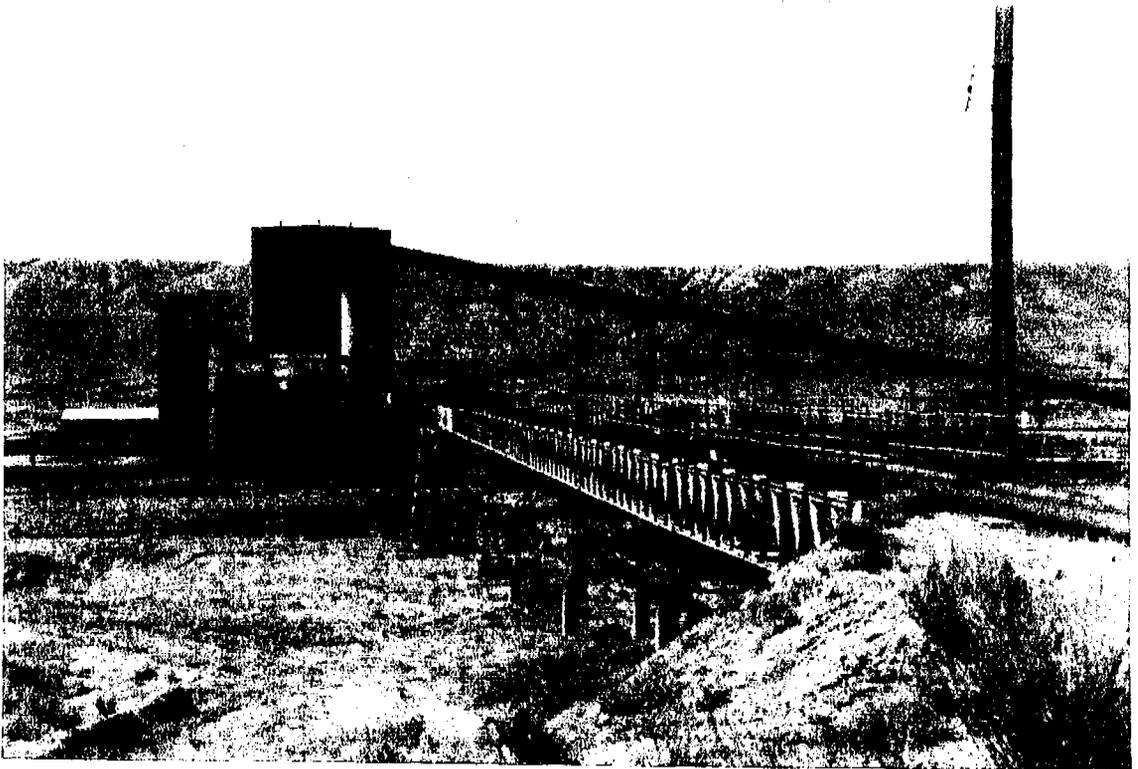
Preparation Plant and Thermal Dryer and Existing Slurry Line
